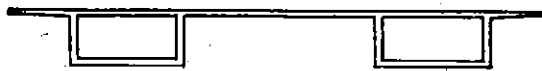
Twin-box-section bridge deck with interconnecting top slab
